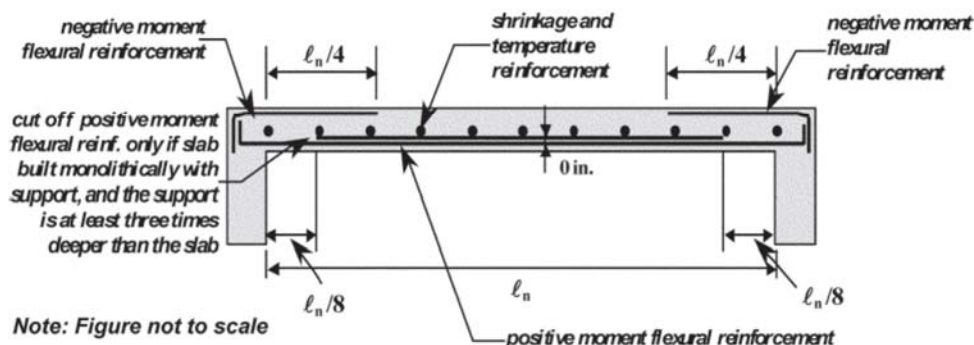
Reinforcement for single-span one-way slabs.
